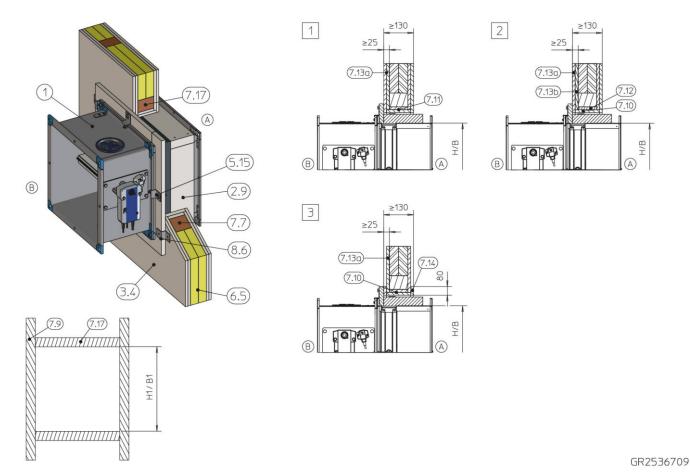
Dry mortarless installation into a lightweight partition wall with timber support structure, with installation kit ES
